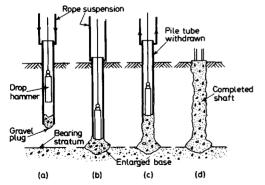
Driven and cast-in-place pile (end closed by gravel plug)
